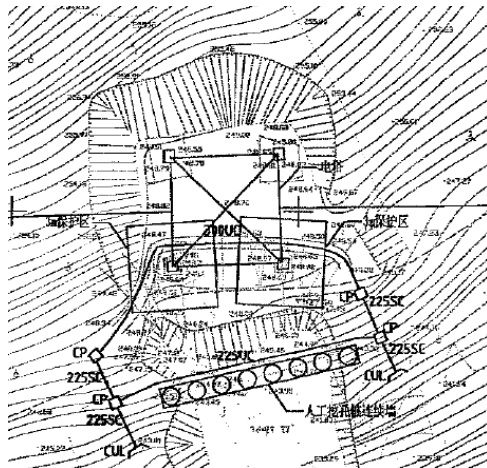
Proposed 1st Upgrading Scheme – Hang Dug Caisson Wall Layout Plan
